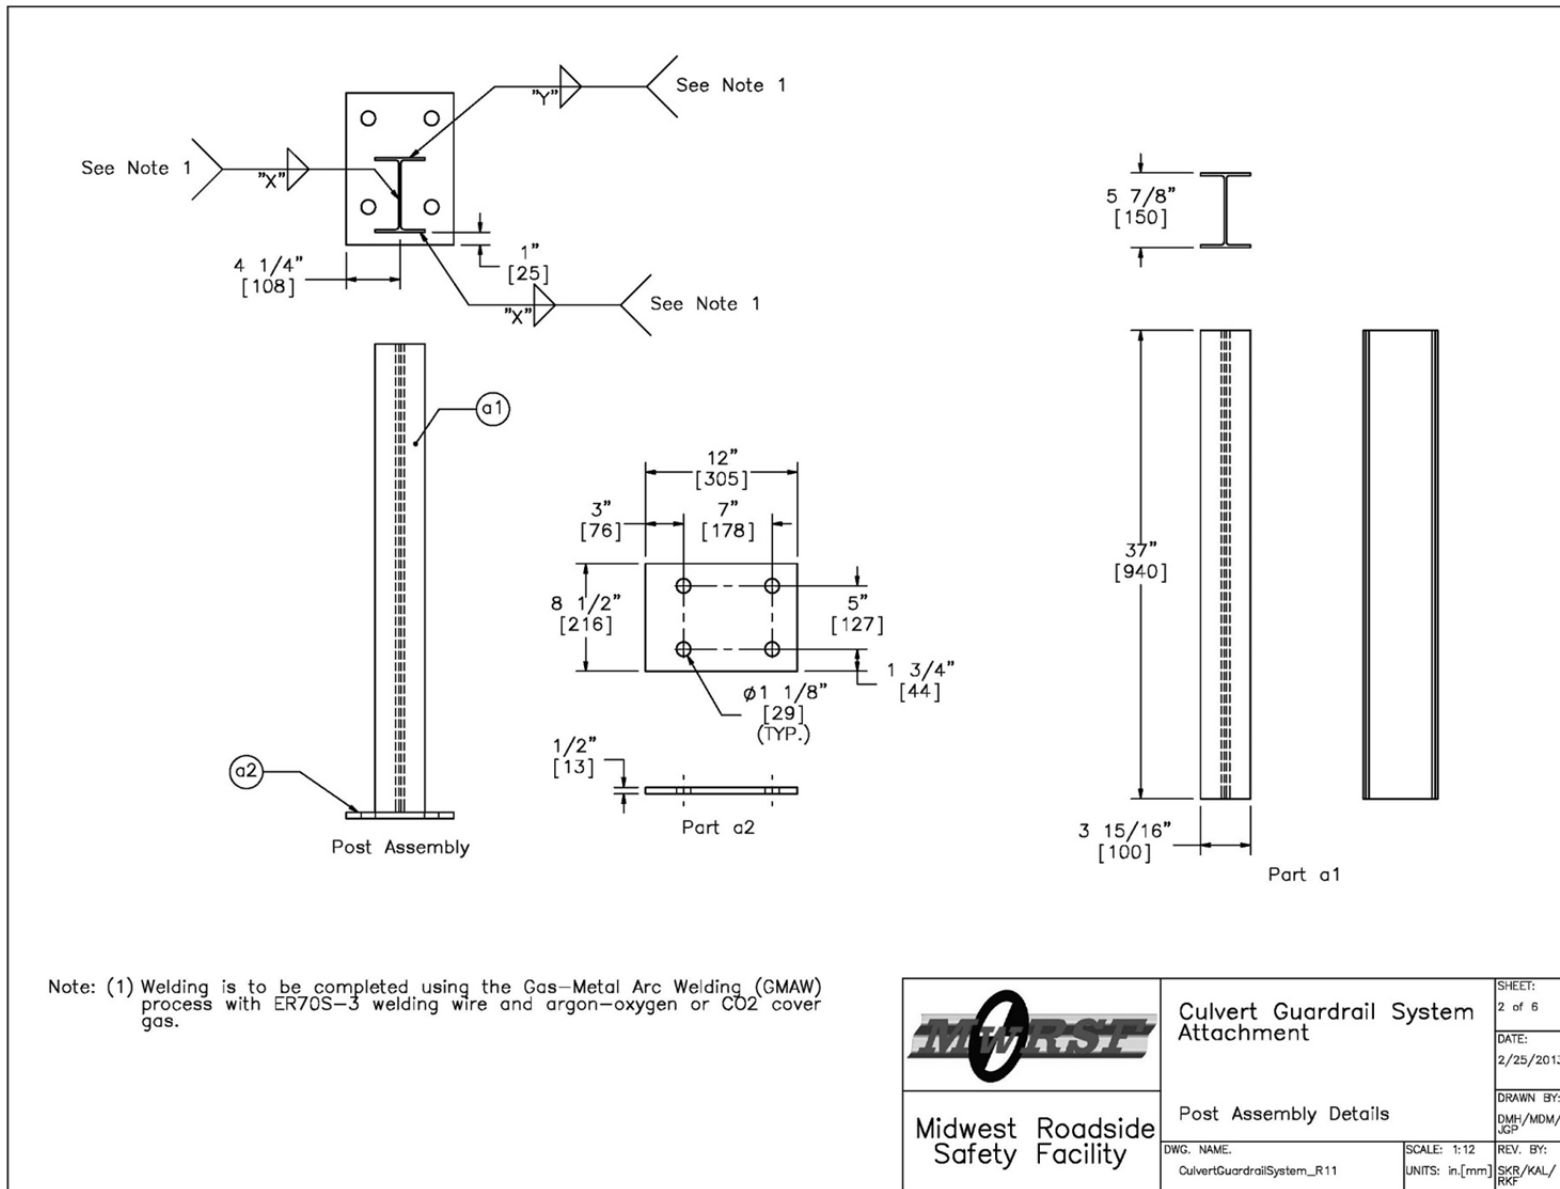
Post Assembly and Weld Details, Test Nos. CGSA-1 through CGSA-4
